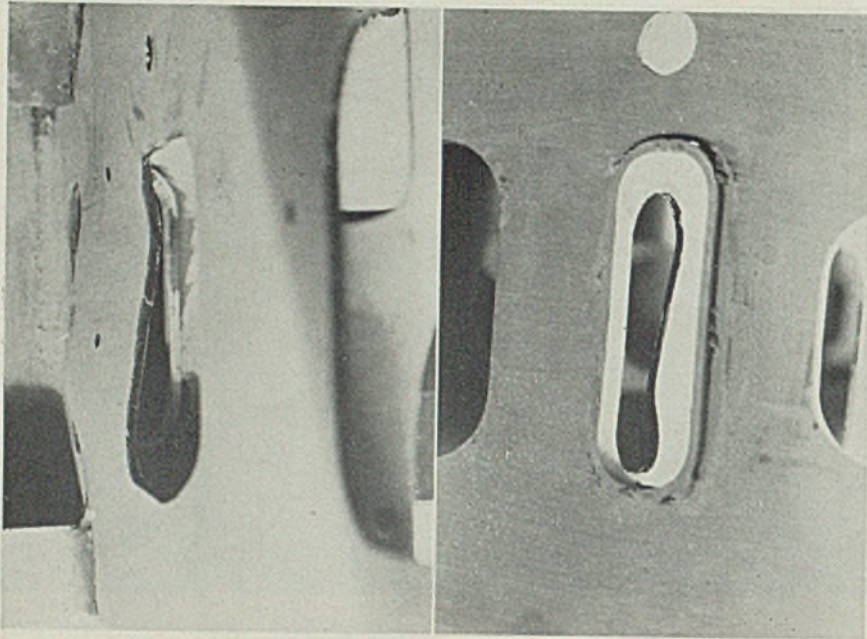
(left)—Closeup of edge of web which buckled in destruction test. Crippling appears to be a pure column failure. Fig. 7 (right)—Another view of crippled web after destruction test
